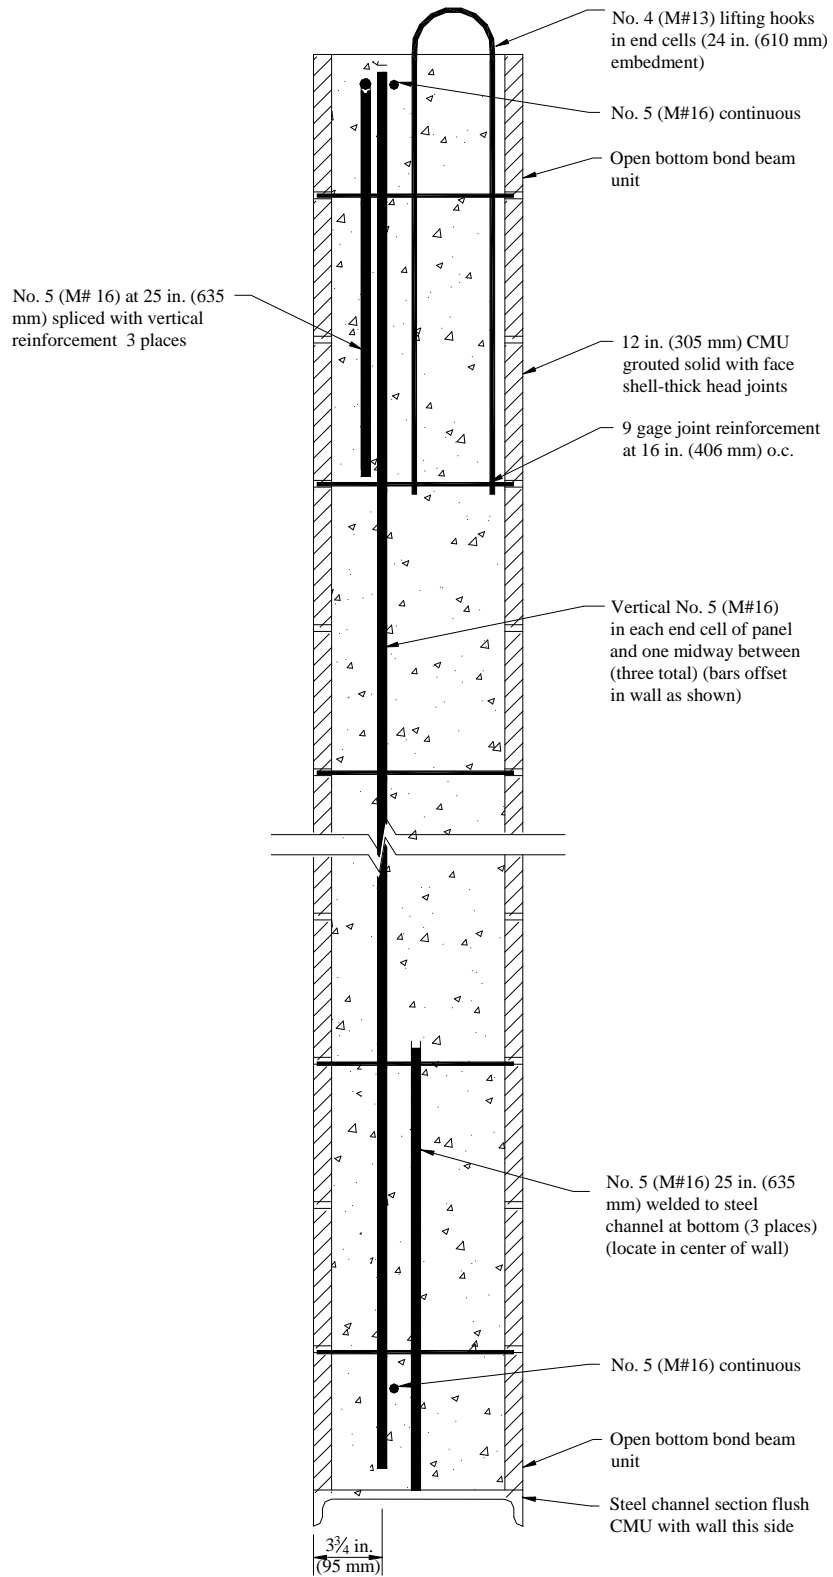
12-inch, solid-grouted control section (Wall 1)
